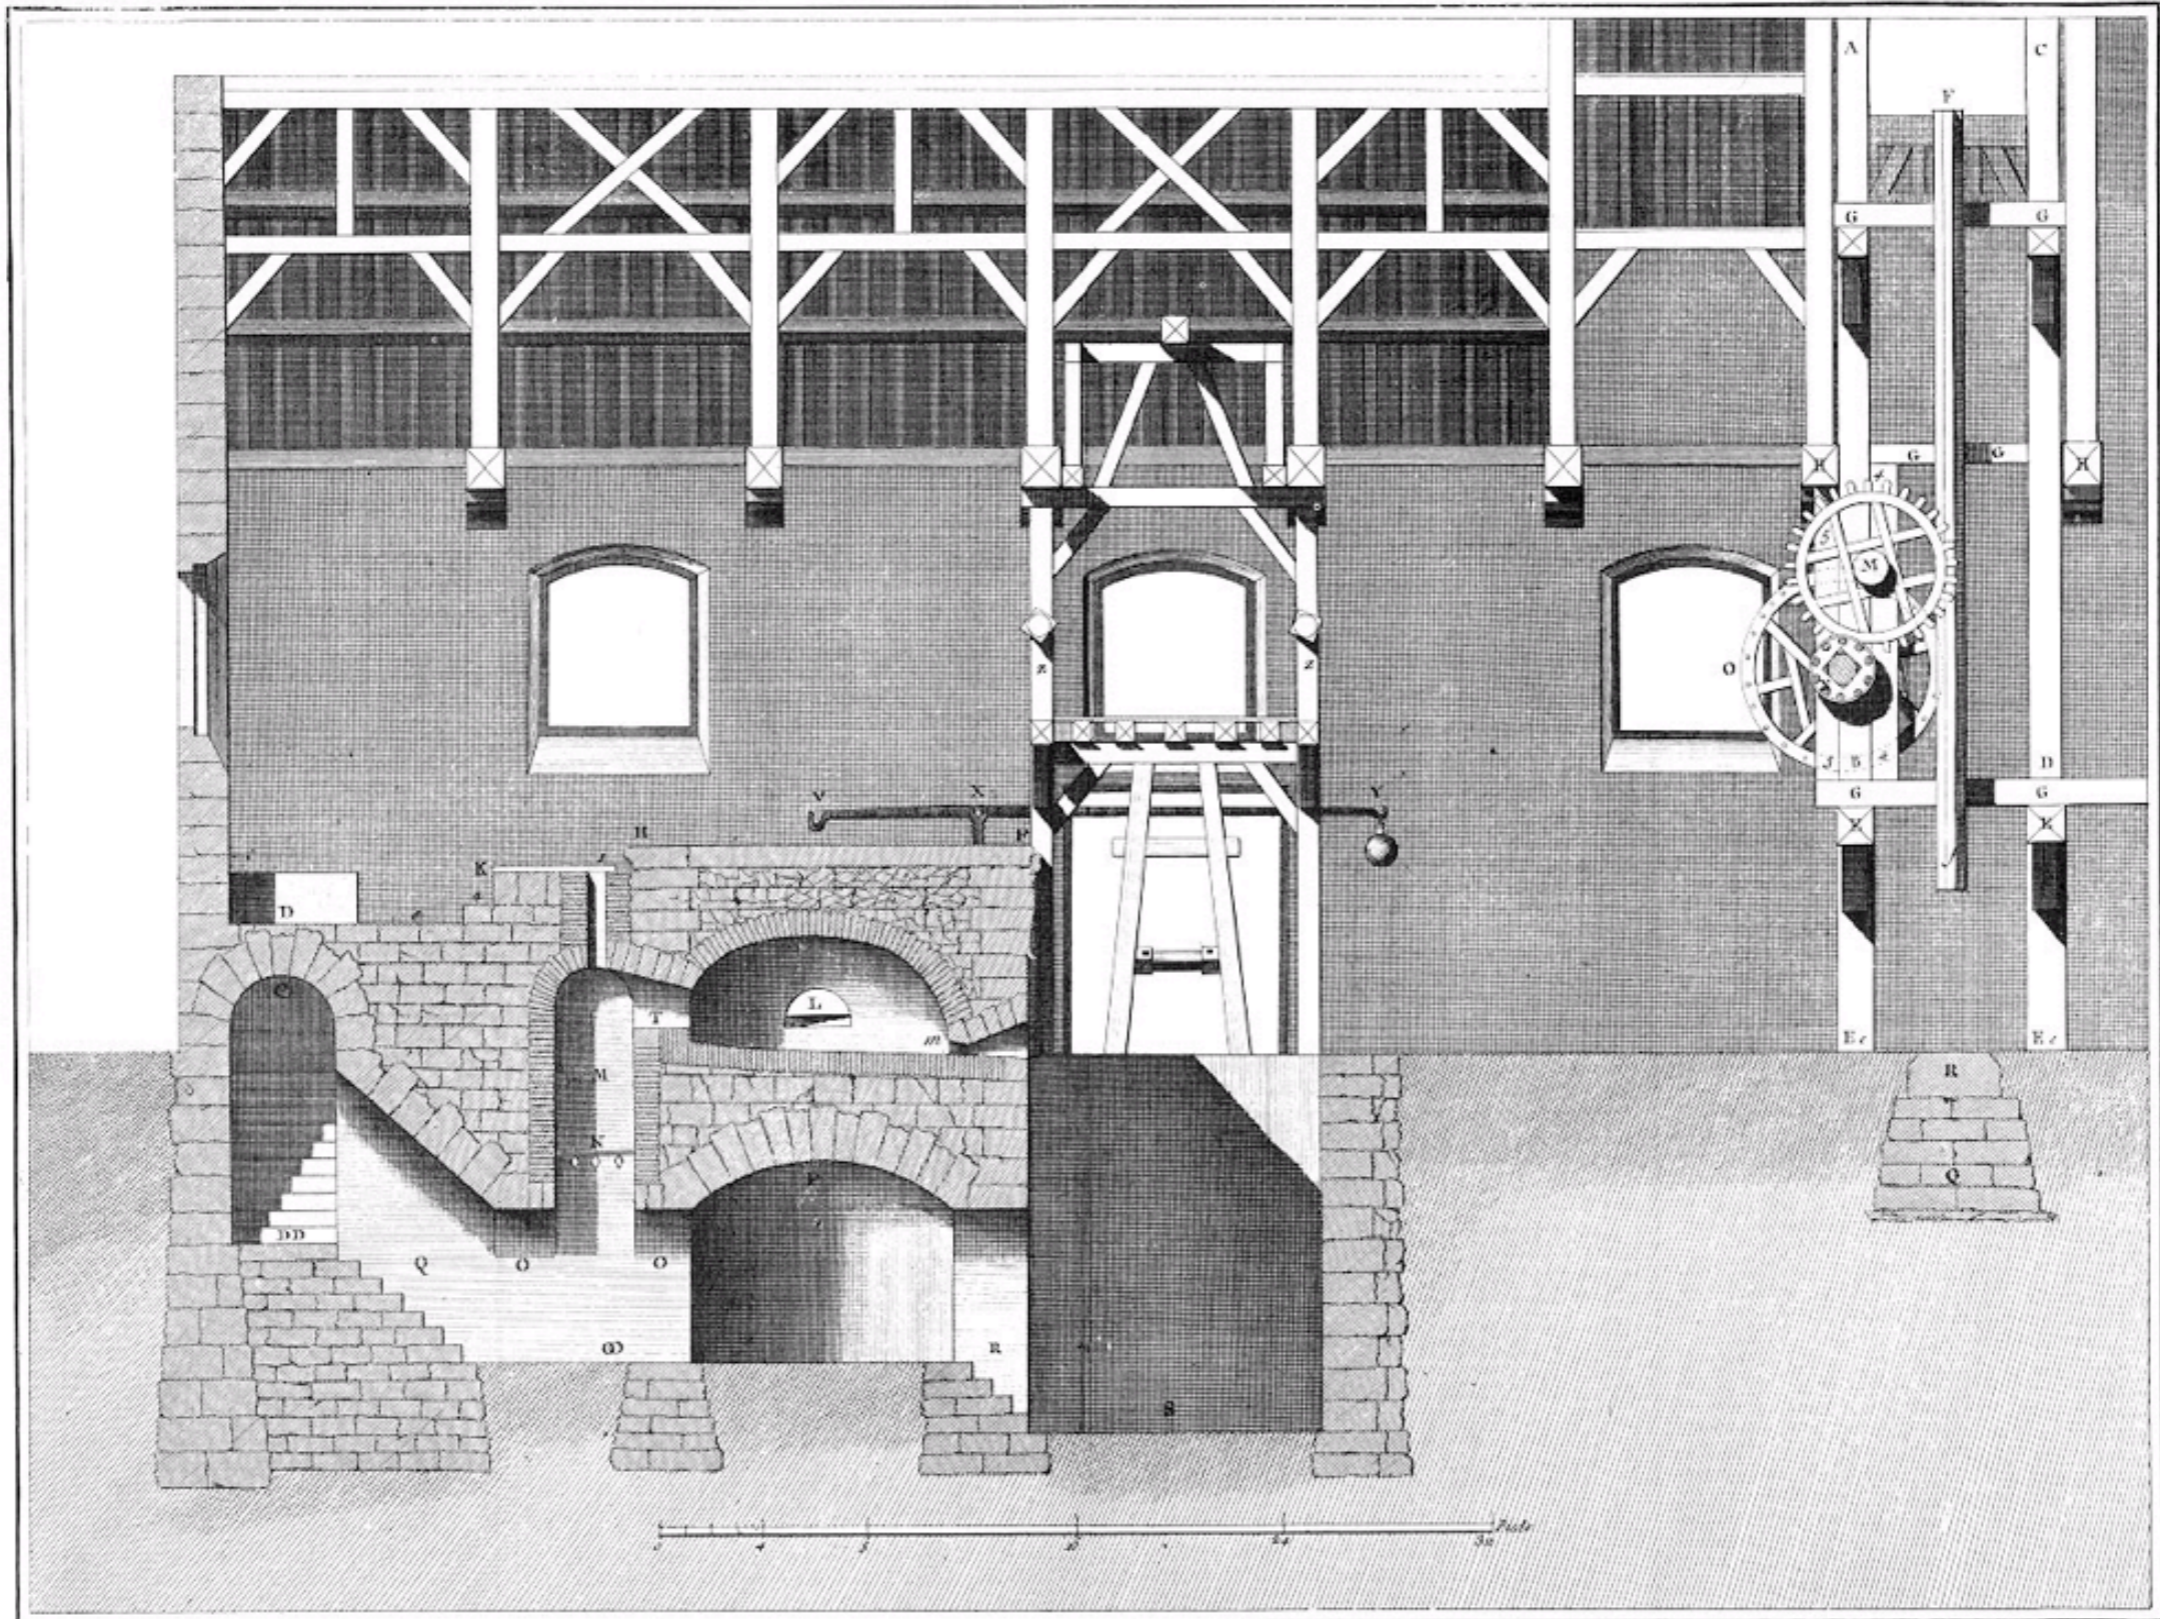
Plate I: Cannon Foundry, General Plan of the Foundation of the Oven
